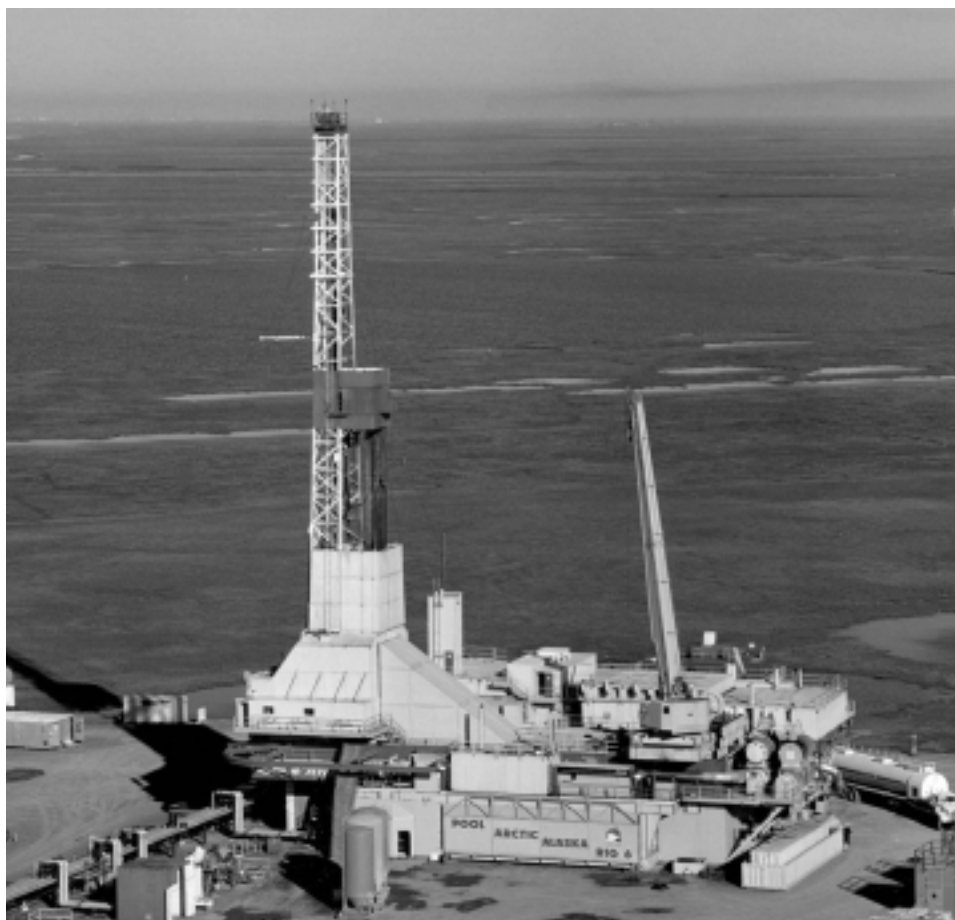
The completed drill rig module, with 100 ton (90.7 m ton) crane sitting piggyback. The mast extends 80 ft (24.4 m) above the drilling floor.
